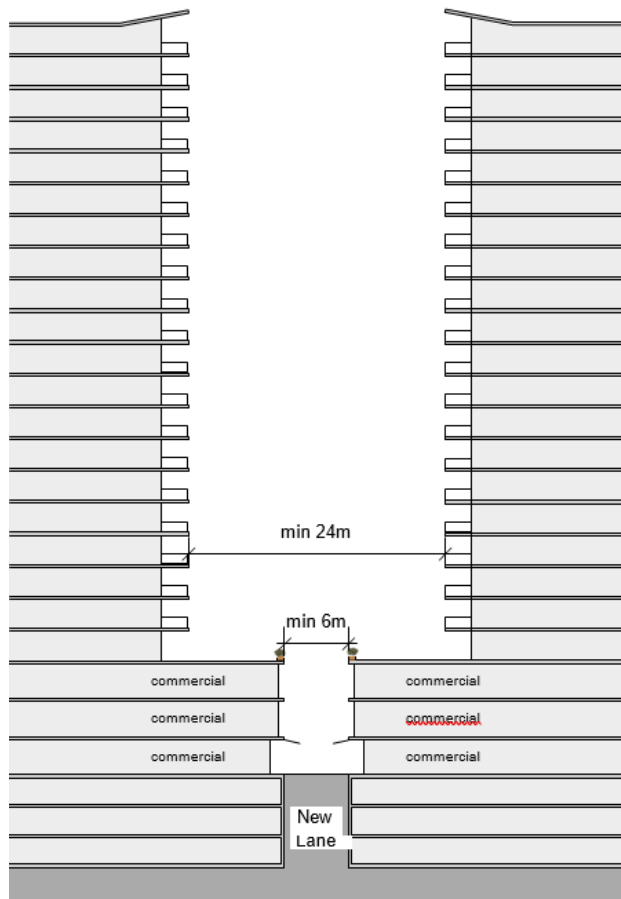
Setbacks to New Lane connecting Rawson Street to Beecroft Road
